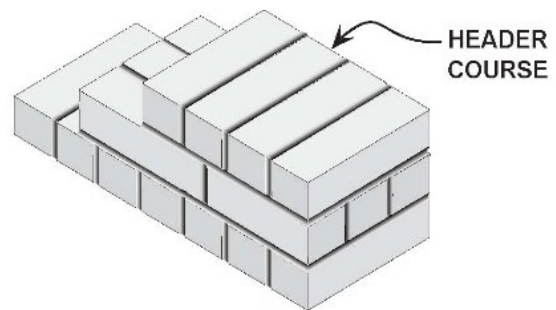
Brick Manhole, Inlet or Catch Basin
